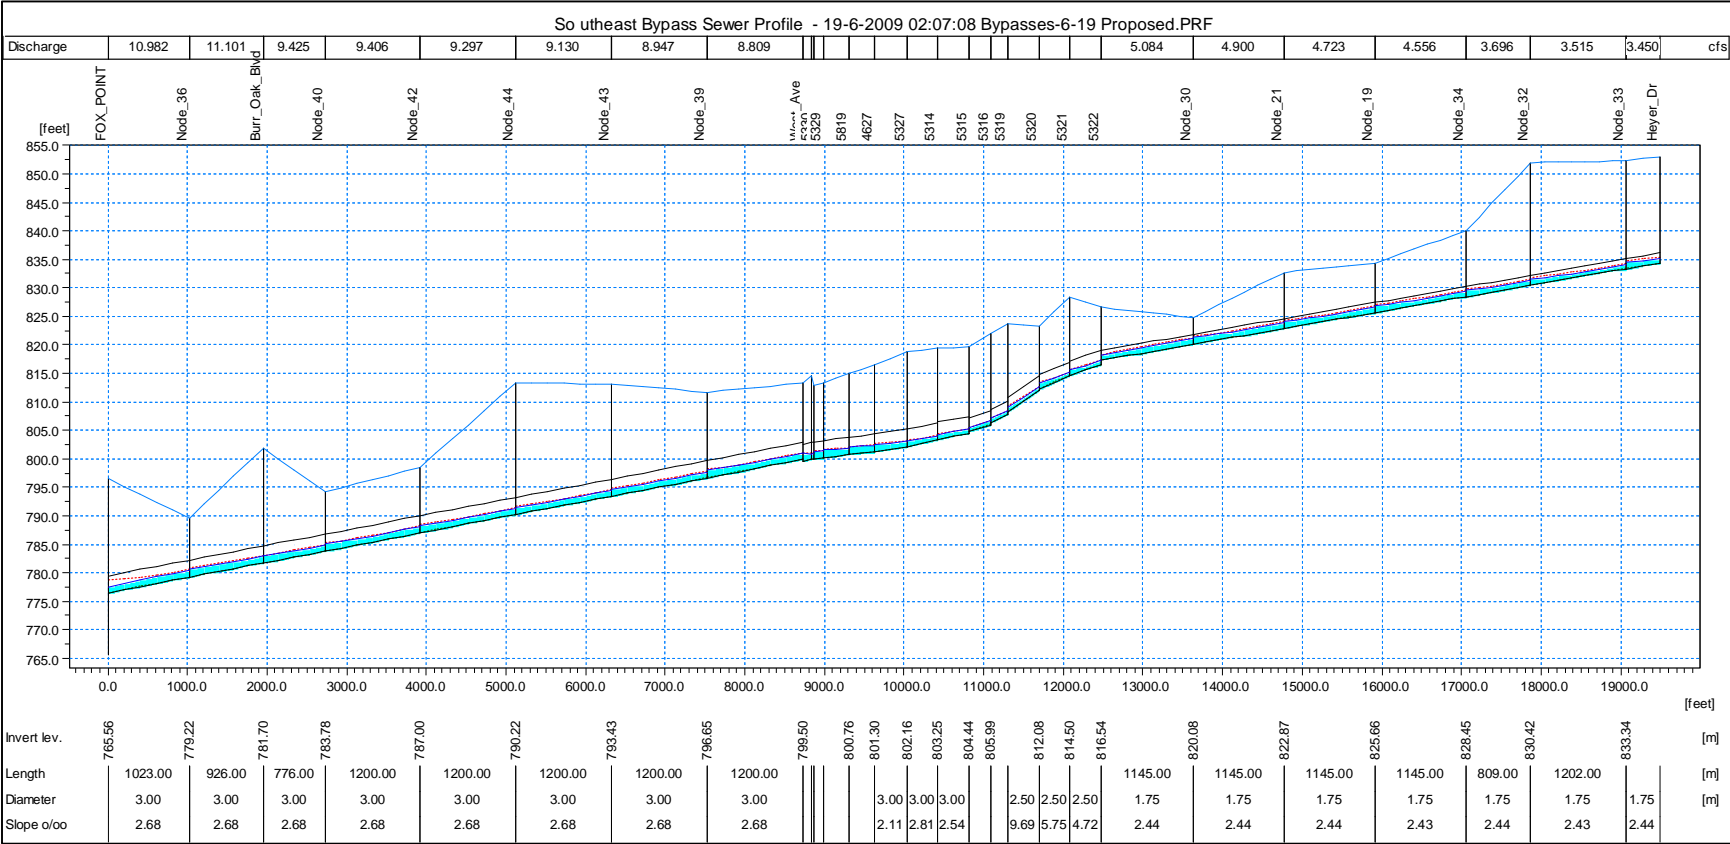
Southeast Bypass Sewer 25-Year HGL
